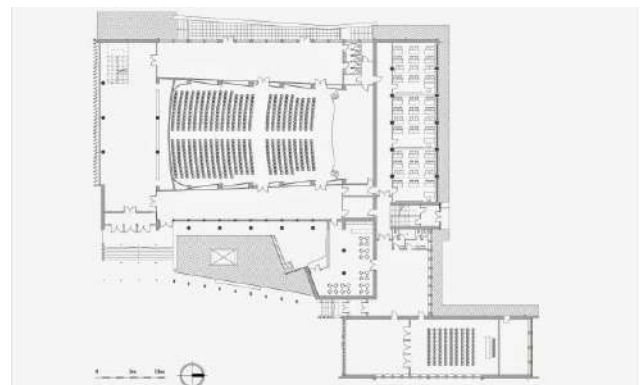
The groundfloor, reconstruction by architect Branko Todorović
